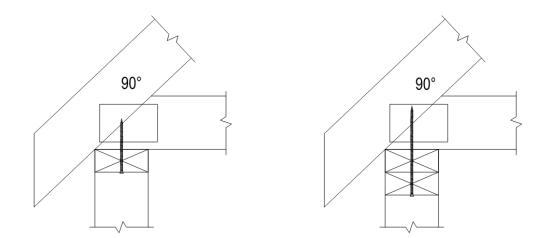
Installation of Fasteners Perpendicular in Single or Double Top Plate to Truss/Rafter/Joist Applications
